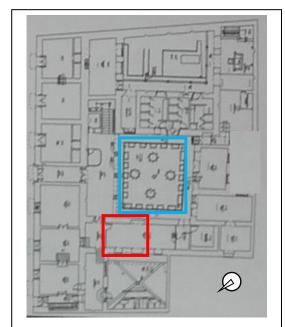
First floor Casa de La Independencia Room Nº 2 localization in red and main interior courtyard in blue. Source: Corporación La Candelaria.
